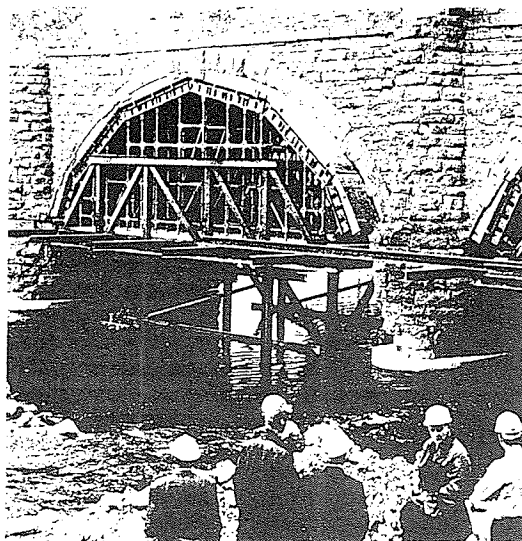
Piers 2 & 3 with reinforced concrete collars.
